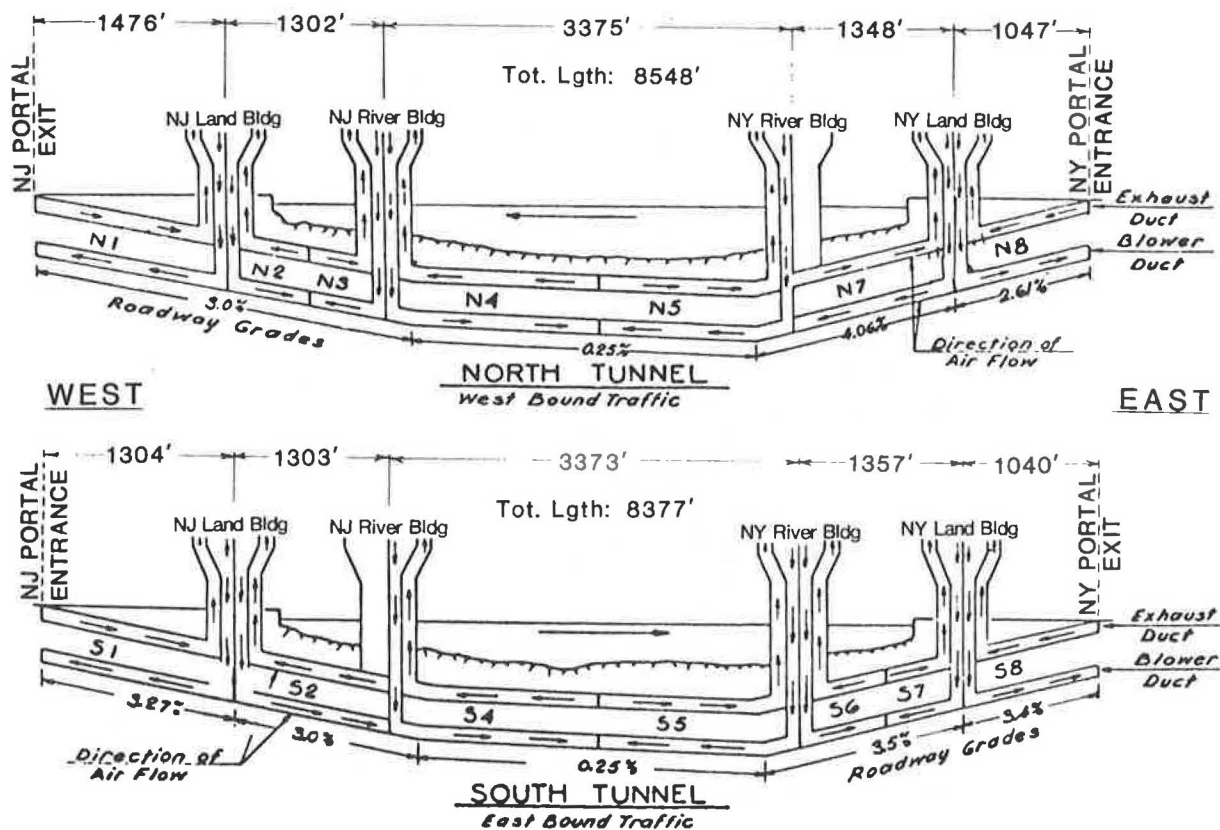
Longitudinal cross section of Holland Tunnel tubes.
